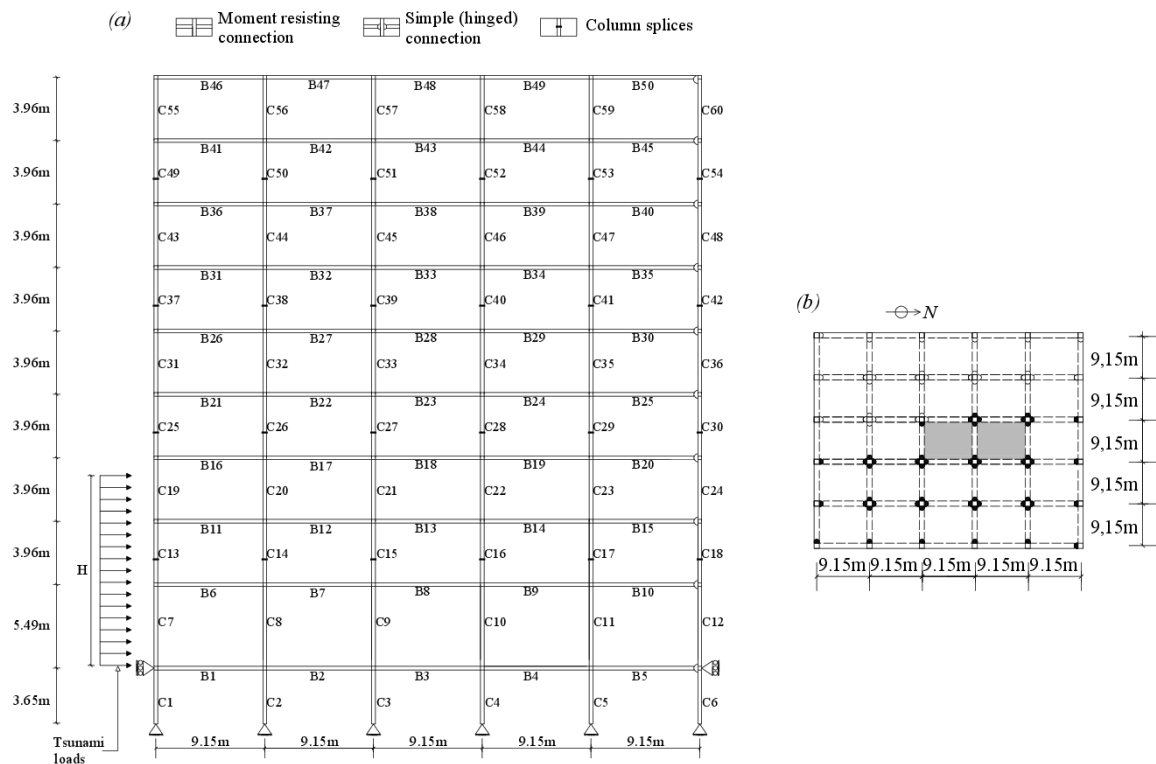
Los Angeles 9-Story steel moment frame building (LA9 building): (a) elevation of the SMRF in the NS direction (exterior frame); (b) plan view.
